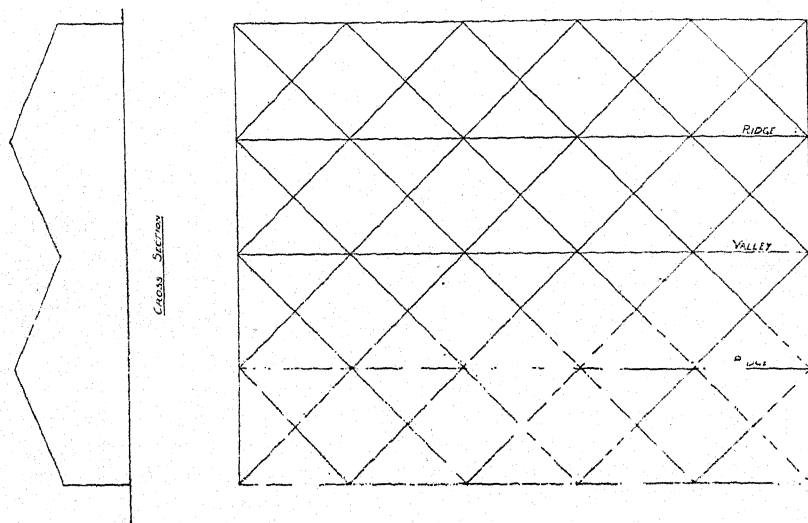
Multiple ridge and valley roof—cross section and plan.
